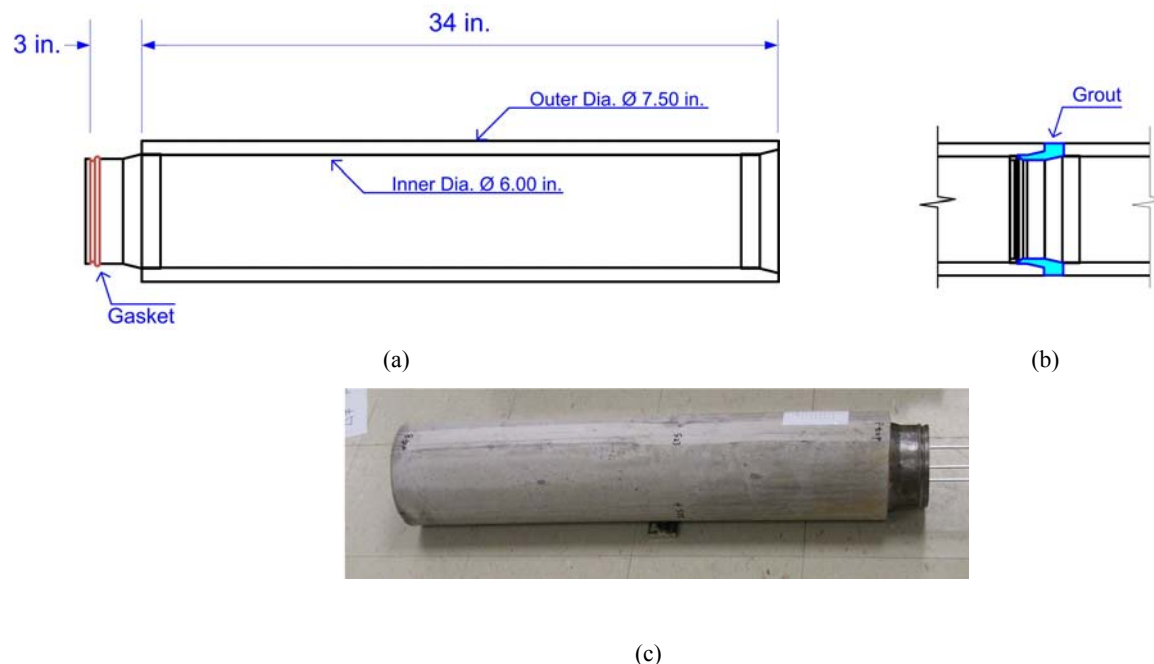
Concrete pipe segment: (a) cross-section view of the pipe; (b) grouted connections; (c) picture of a typical pipe segment.
